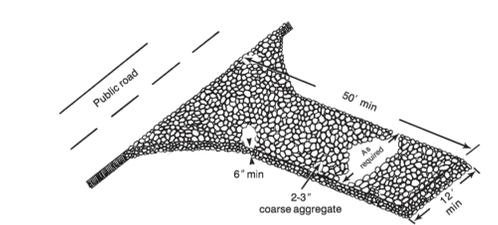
Gravel entrance/exit keeps sediment from leaving the construction site (modified from Va SWCC).
